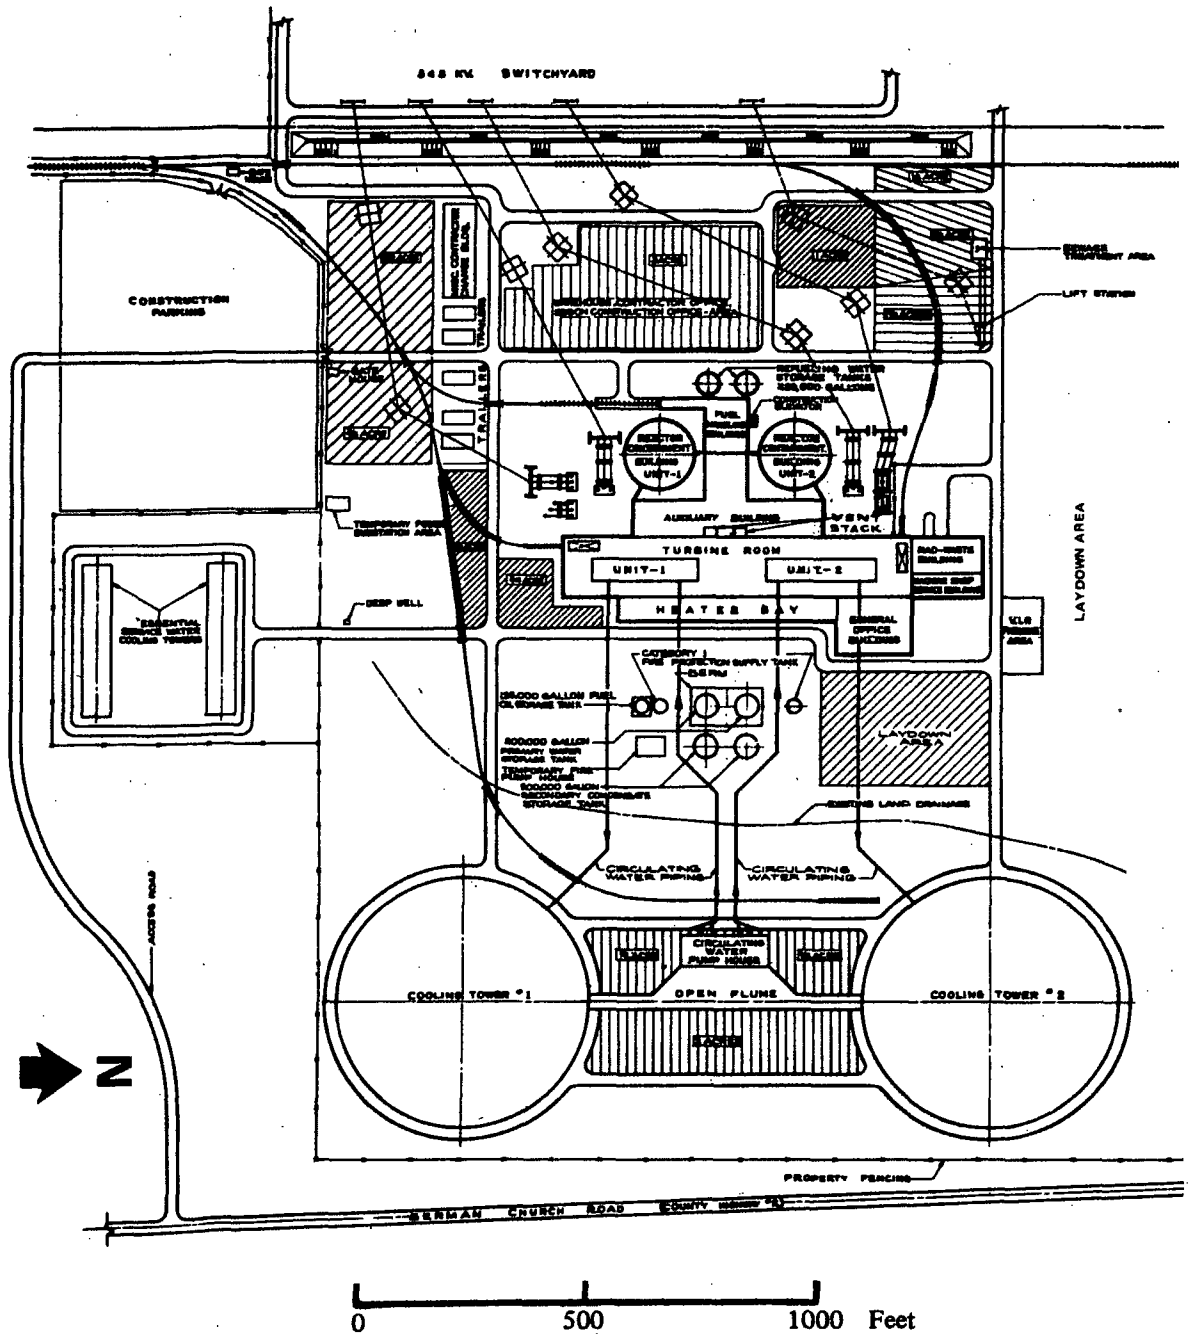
Detail Plan of Plant Structures. From applicant's Environmental Report.
